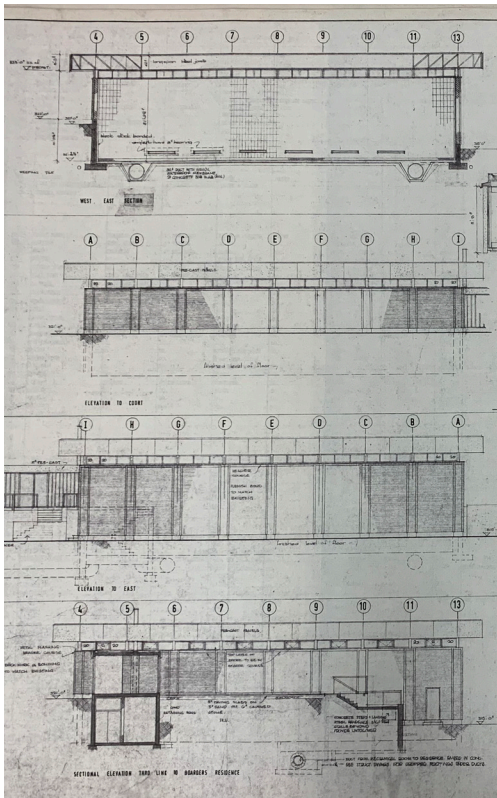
Section and elevations of Building D (T. V. Murray, 1964).
